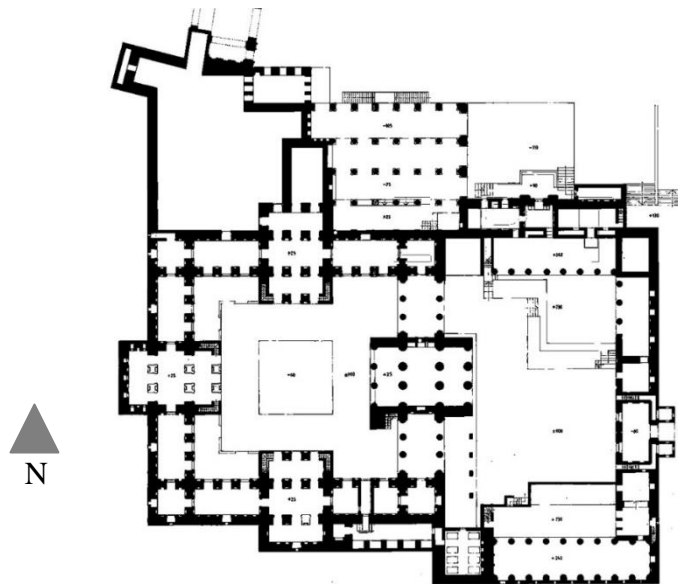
Ground Floor layout Plan of Ram Raja Mahal (CEPT Archives, n.d.)
